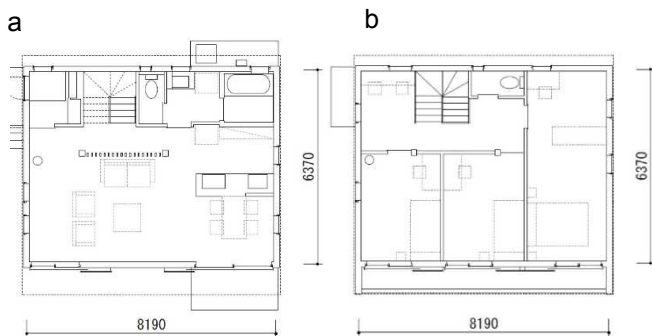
Plan of B1-type house (a) grand floor; (b) 1st floor
